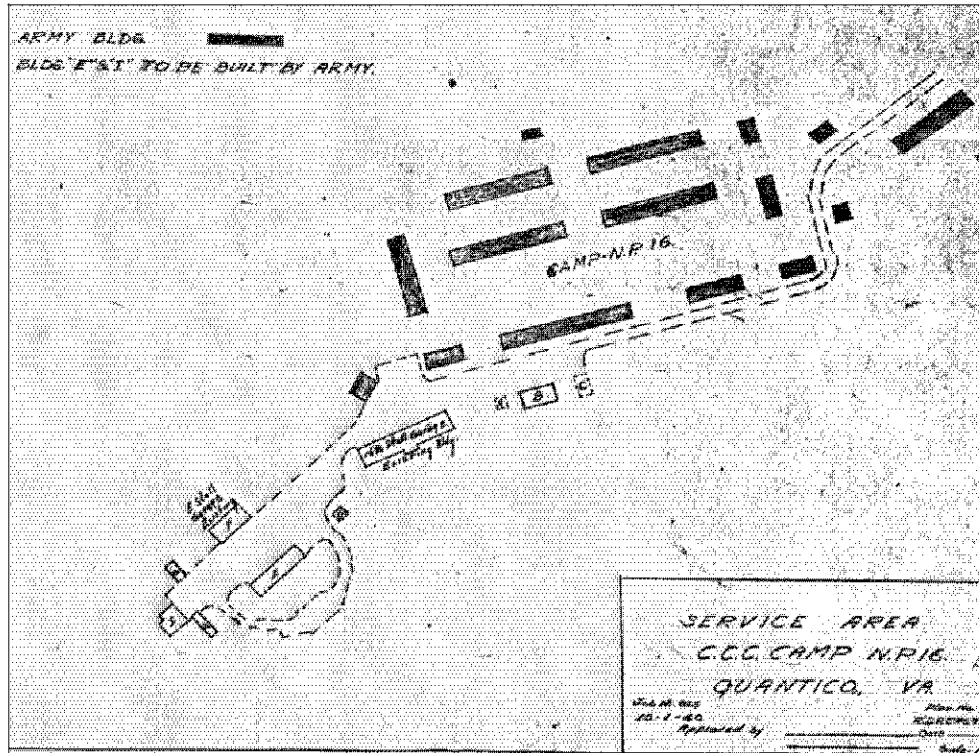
Camp NP-16-VA (Chopawamsic RDA) Site Plan, 1940.
